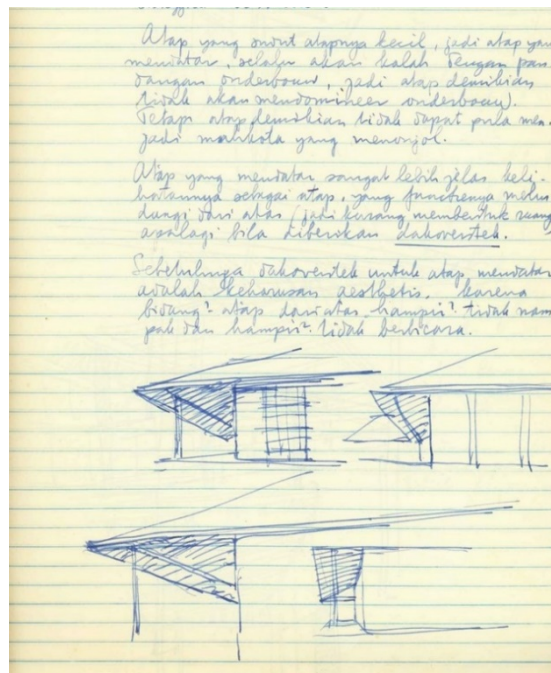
Silaban’s sketches of the space below the roof and eaves¹⁴⁾
